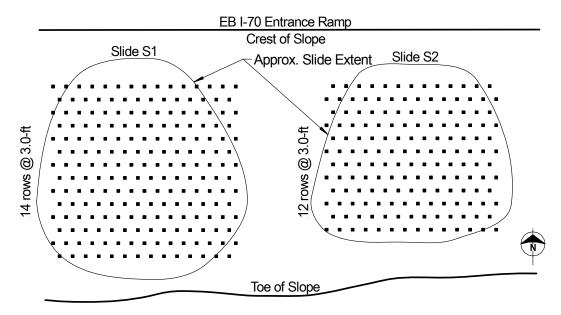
Plan view of slide areas S1 and S2 at the I70-Emma site showing selected layout of reinforcing members.
